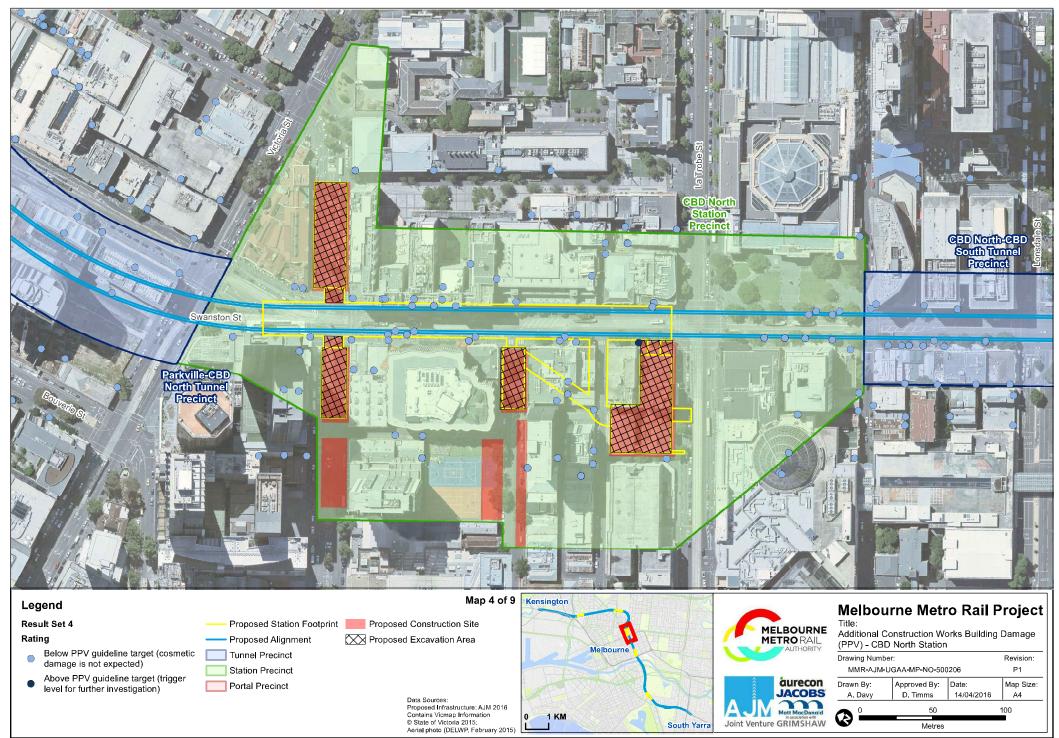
Colour coded building damage assessment due to Additional Construction Works – CBD North Station Precinct
